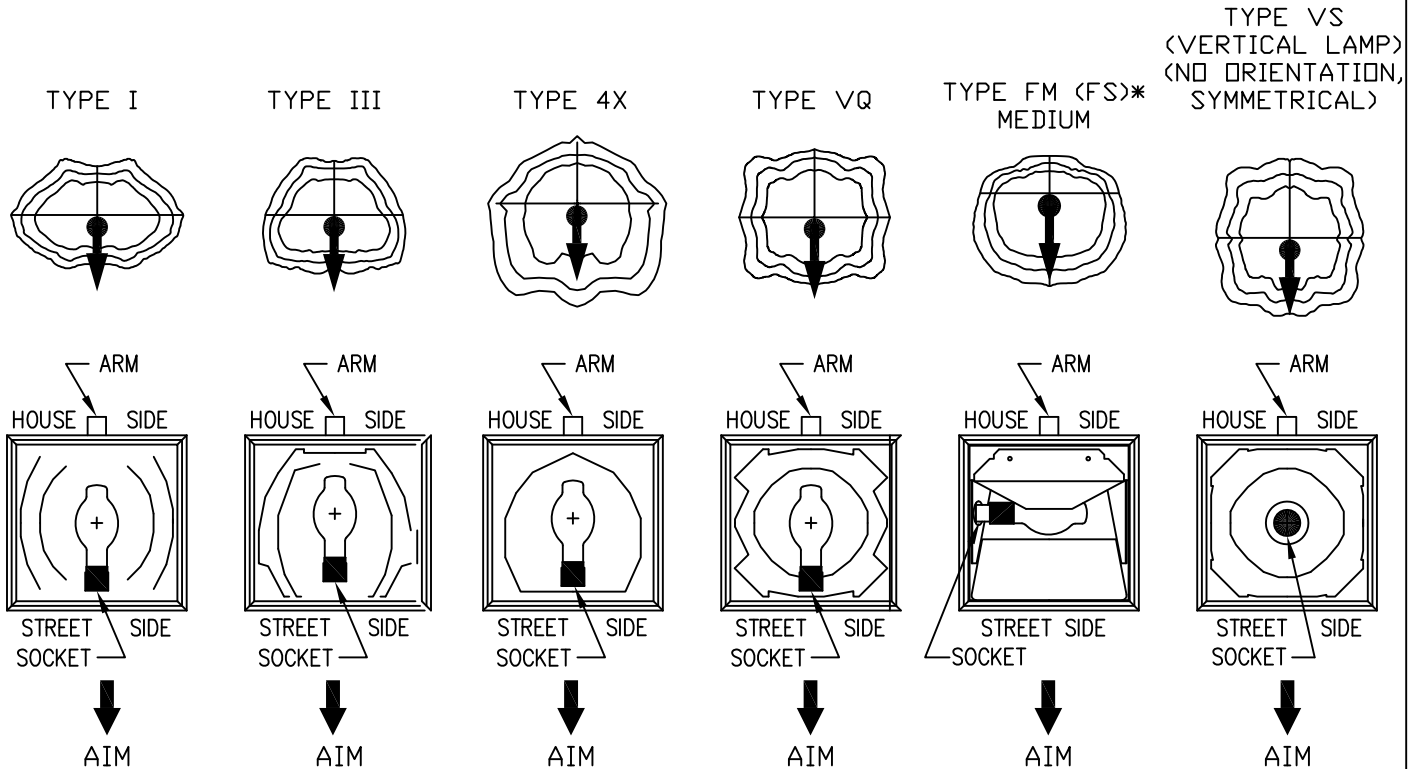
Illustrates typical site plan luminaire symbols, viewed from above, as they would appear on a site plan. When orientation direction arrow is omitted, assume reflector is to be mounted in the "standard position."
